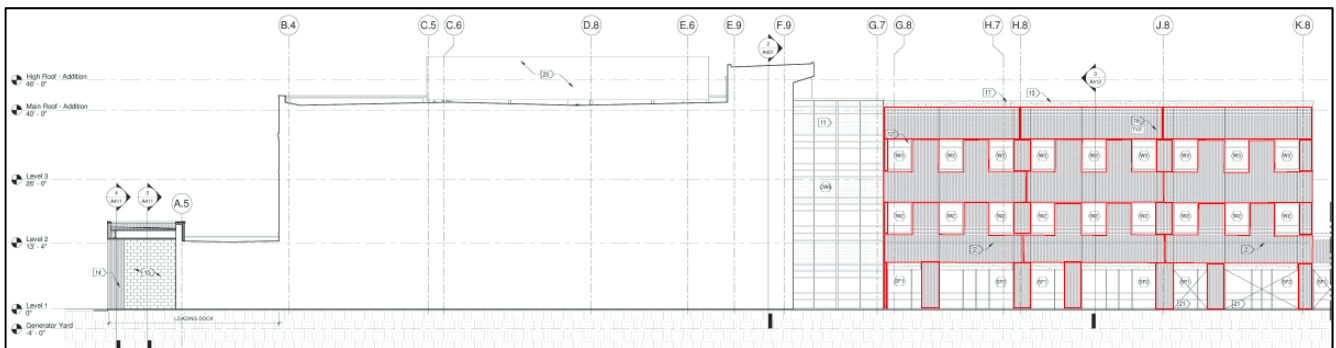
, North Elevation – Storefront windows on the first floor do not permit use of vertical panels.
